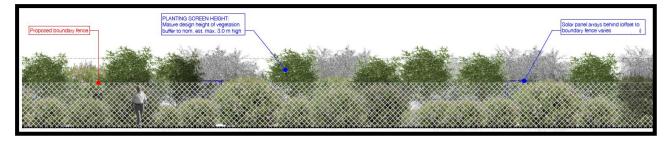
Typical vegetation buffer front elevation (Source: Ground Control Landscape Architecture)
